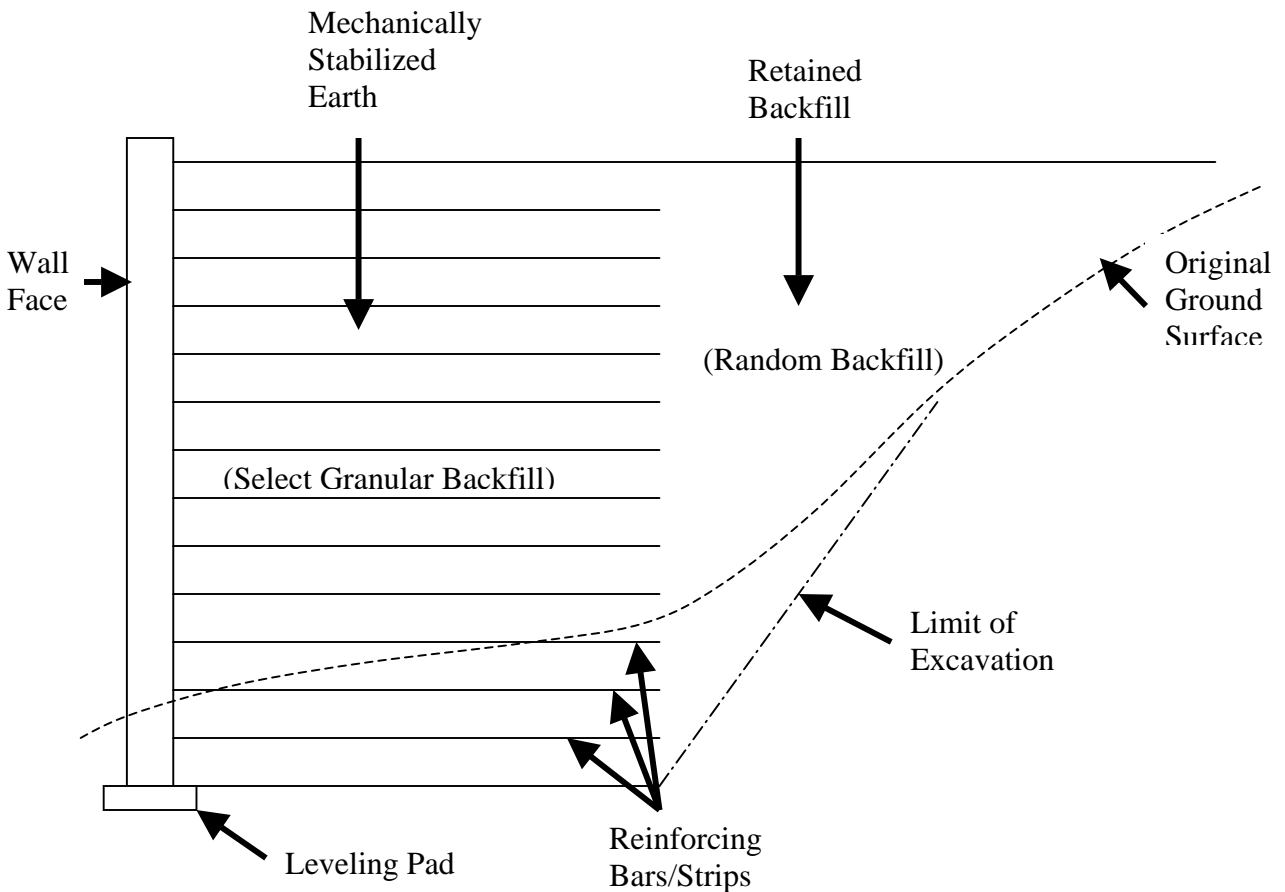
Cross Section of Mechanically Stabilized Earth Wall.
